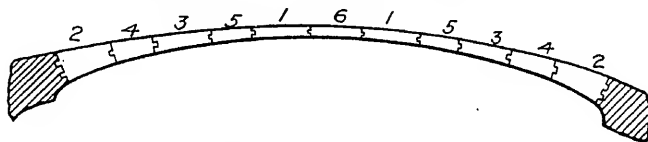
Diagram Showing Order of Placing Concrete in Bridge at Canal Dover, Ohio
